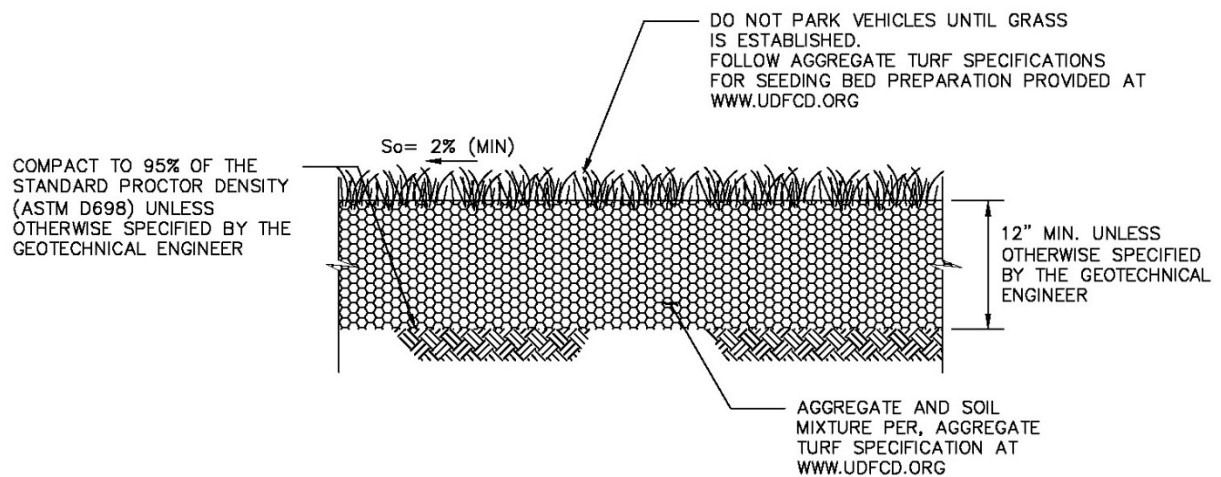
Typical Aggregate Turf Reinforced Grass Pervious Pavement Cross Section
